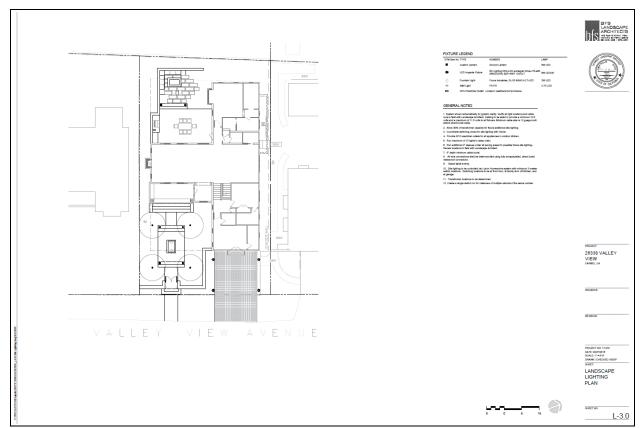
L-3: Proposed Lighting Plan at 26338 Valley View Avenue
